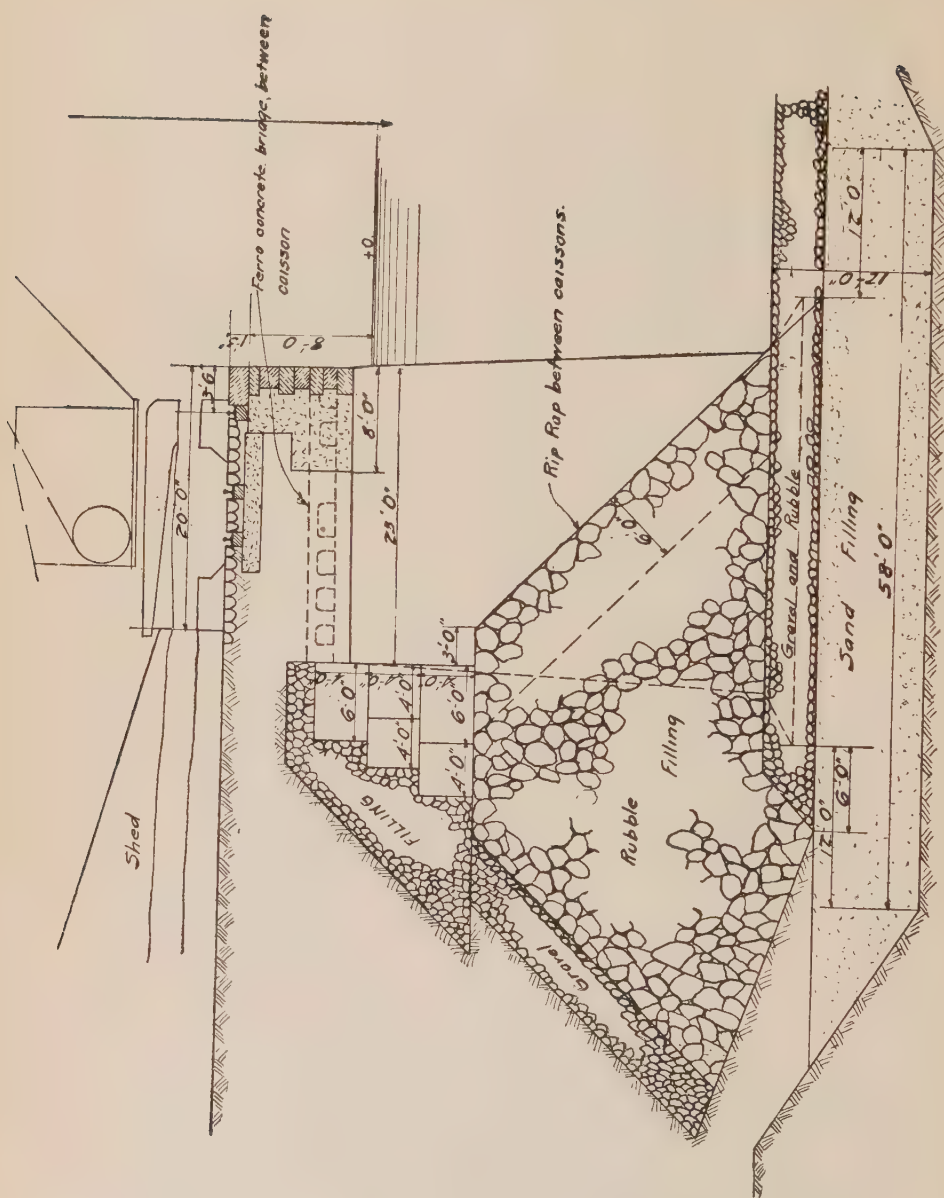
QUAY WALL, KOBE, JAPAN.
